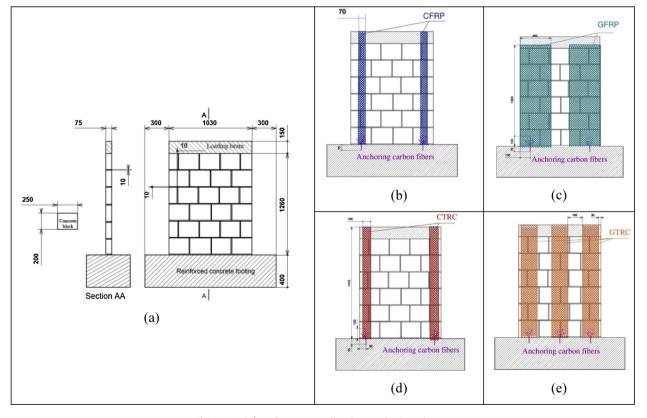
Unreinforced masonry wall and strengthening schemes.
